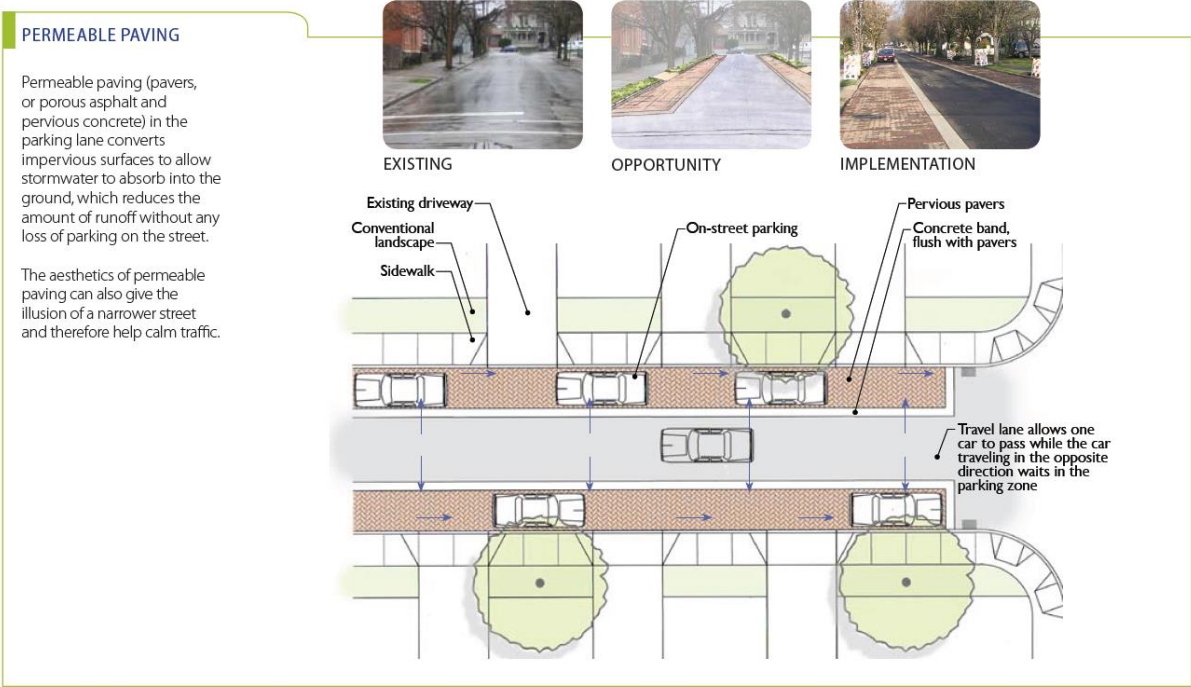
Green Streets with Permeable Pavement (EPA, 2009)
